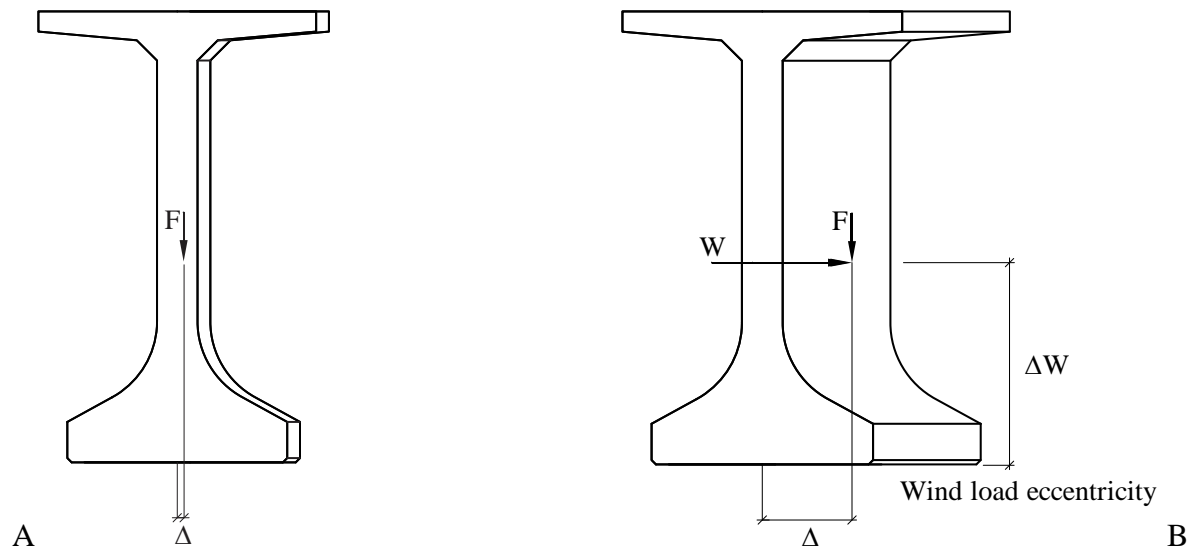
Effects of wind on stability of girder. A) Girder without wind load. B) Girder with wind load.
